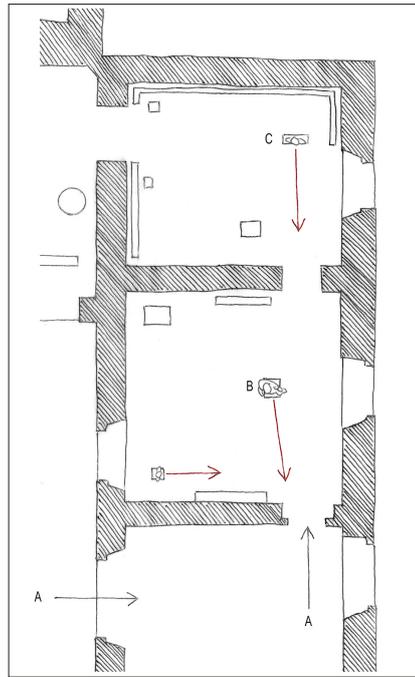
, 3. Palazzo Abatellis, plan detail of the ground floor with arrows showing direction of statues' gaze (left).
